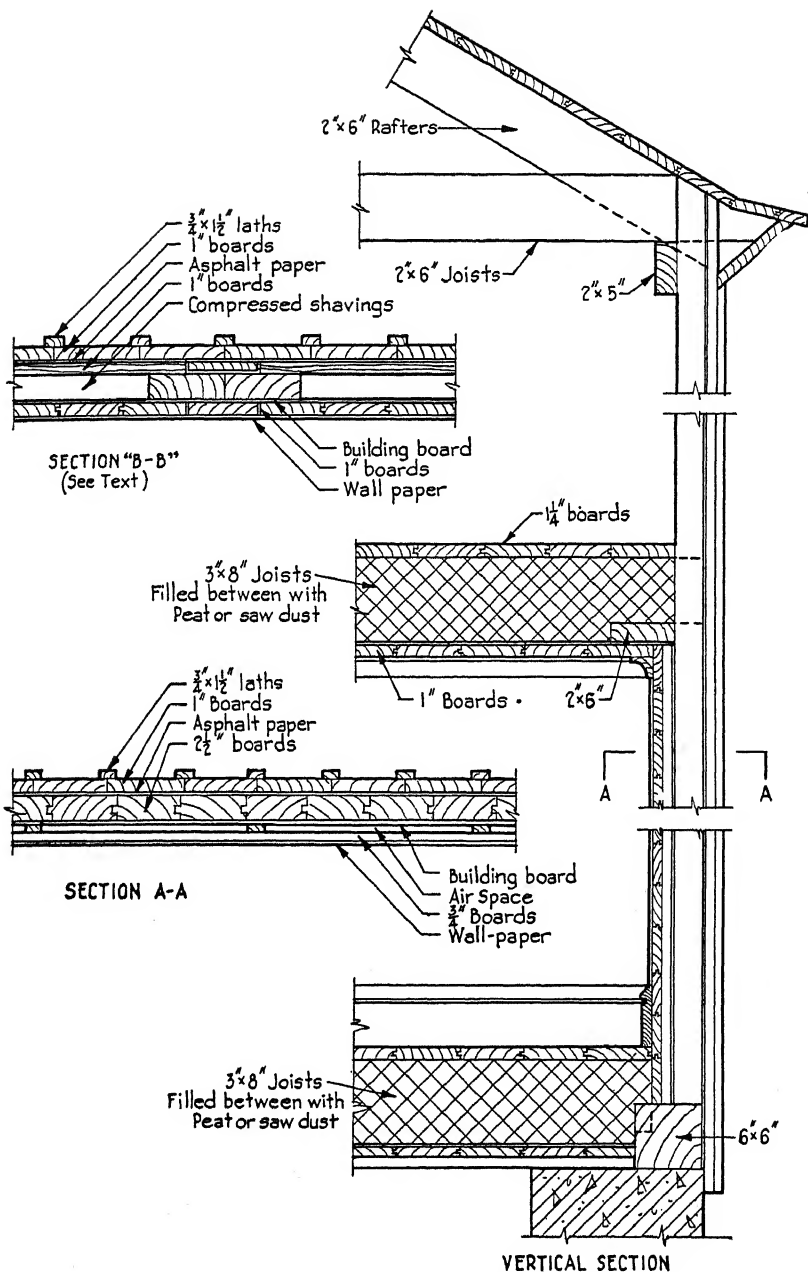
TYPICAL SWEDISH WOODEN CONSTRUCTION
